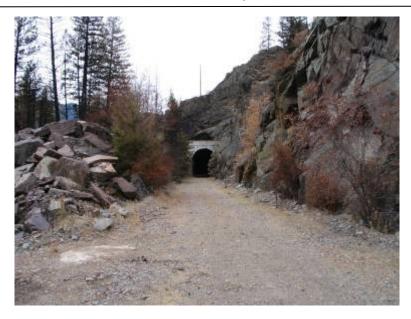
East portal of Tunnel No. 18 on the Milwaukee Road Railroad grade. View to the west.
